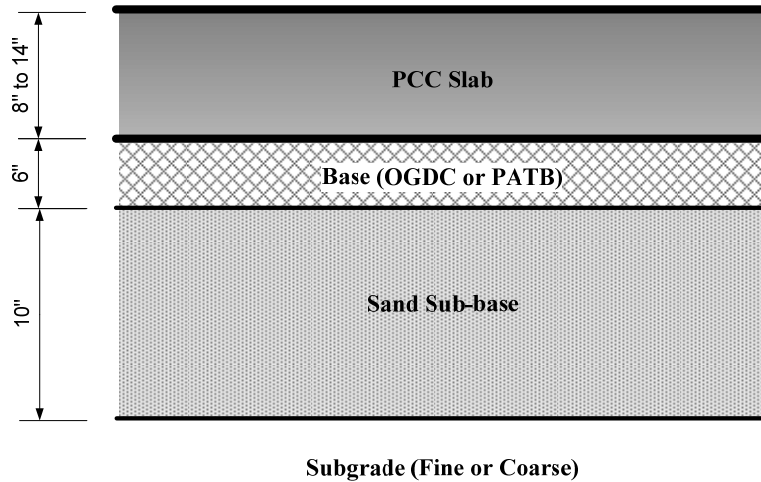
Typical MDOT pavement cross-section — JPCP
